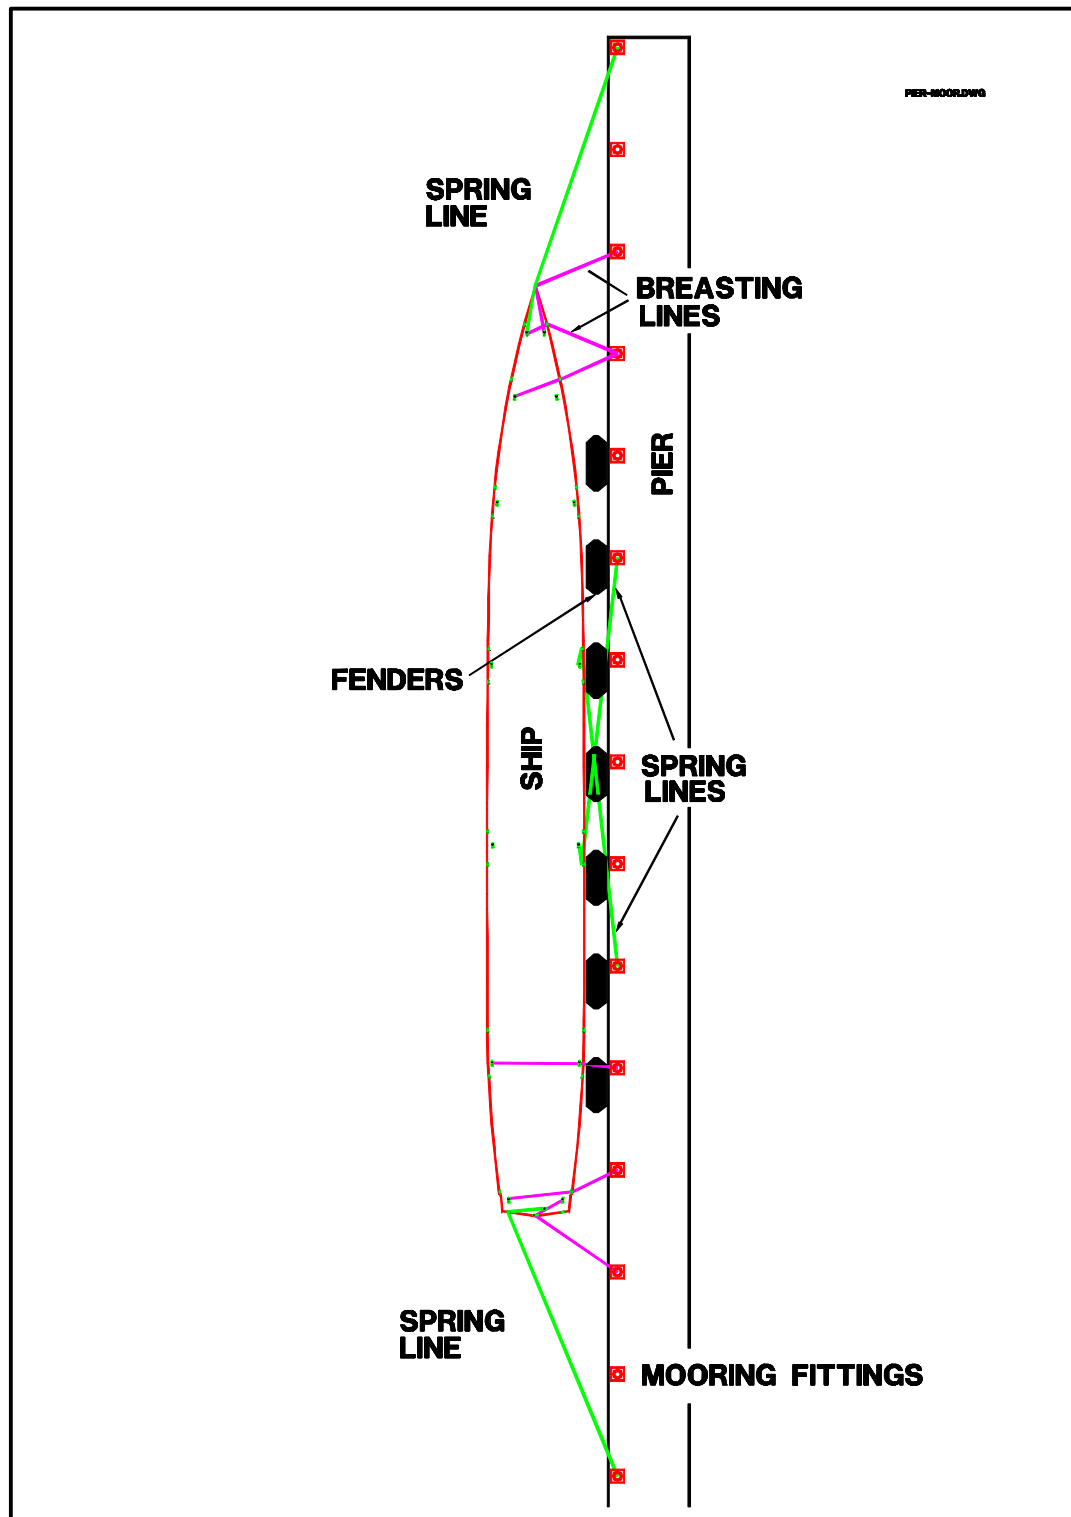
TYPICAL MOORING ARRANGEMENT
